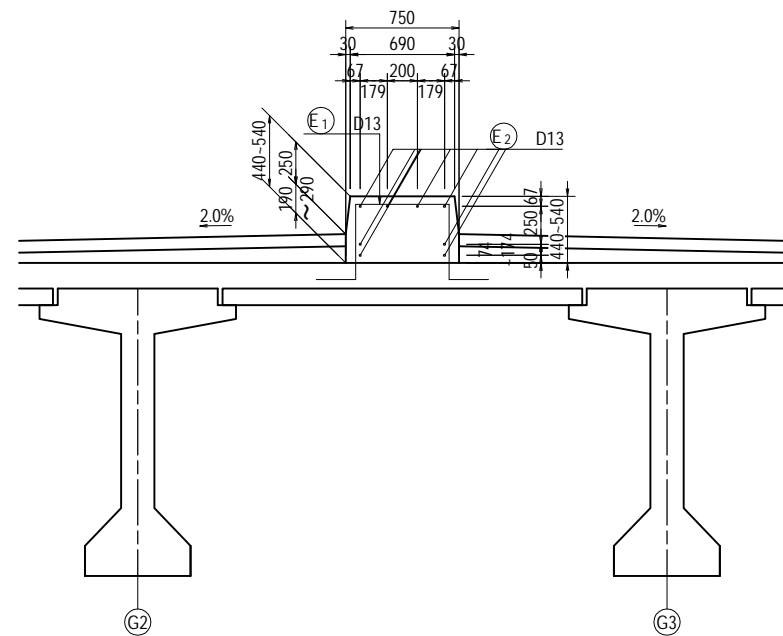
# DETAIL OF CONCRETE CURB, BARRIER AND MEDIUM (PF7-PF11) (3)
